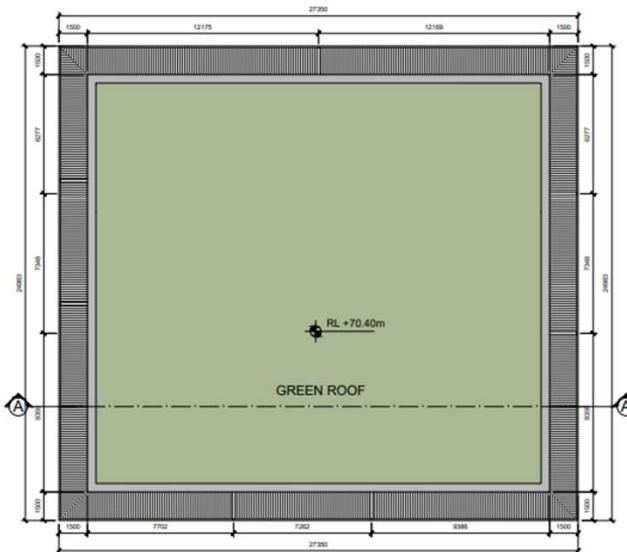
Roof Plan – Extracted from As Granted Scheme – REG.
